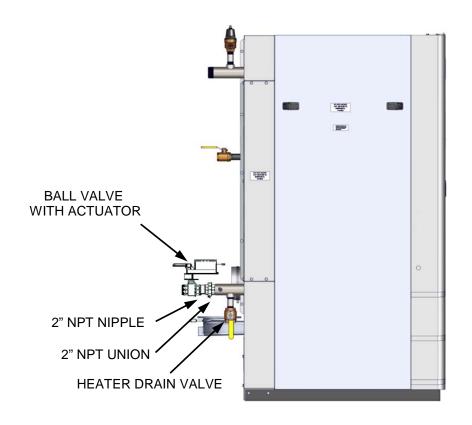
Innovation Water Heater Equipped With Sequencing Valve
